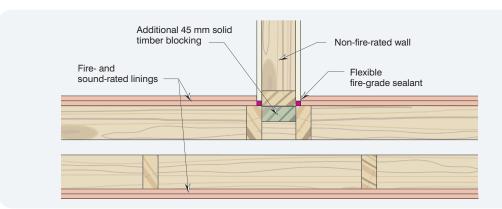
Non-fire-rated single stud wall abutting fire- and sound-rated double stud wall using timber blocks – FRL 60 minutes – plan view
